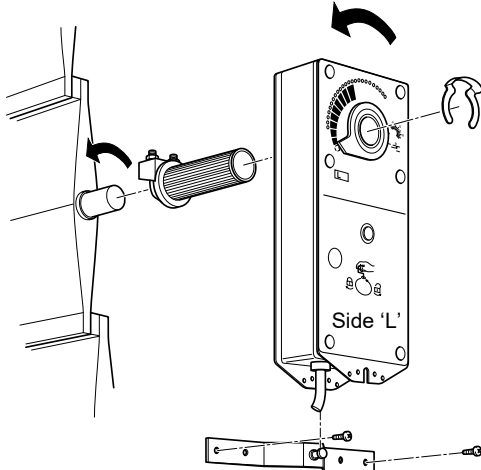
Installation of the actuator with forward rotation to 20-95 mm long shaft
